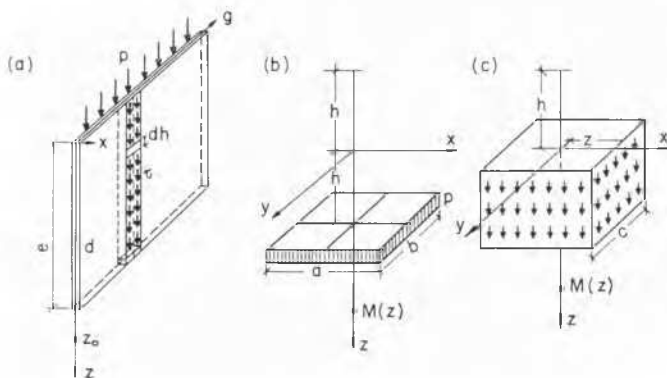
Calculation pattern schemes: (a) single-row pile foundations; (b) and (c) groups of piles.
